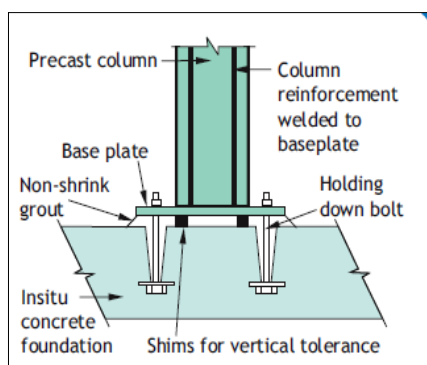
Some illustrations of precast concrete baseplate (The Shockey Precast Group 2001)
